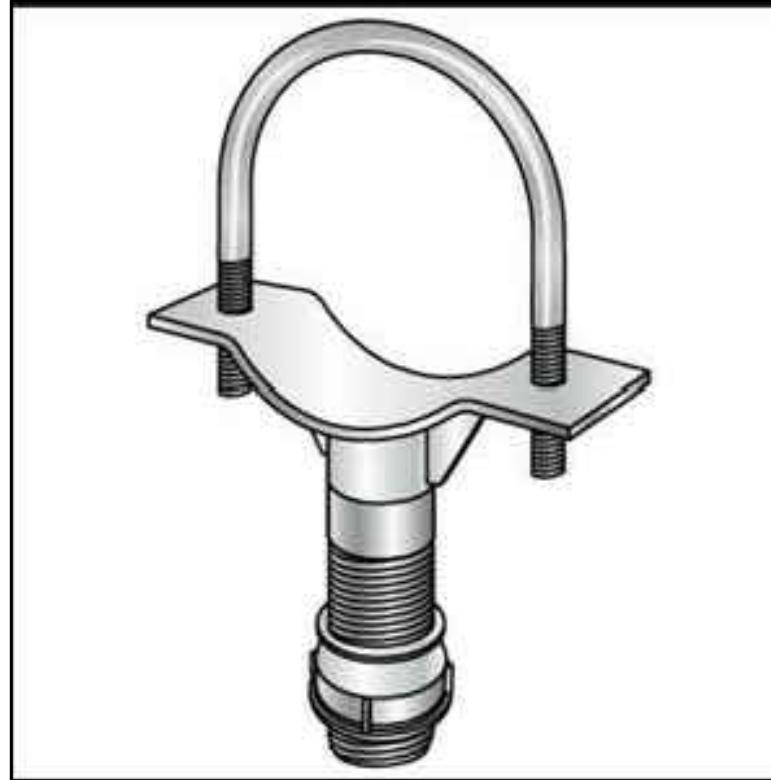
I: TYPICAL MANUFACTURED PIPE SUPPORT COMPONENT
